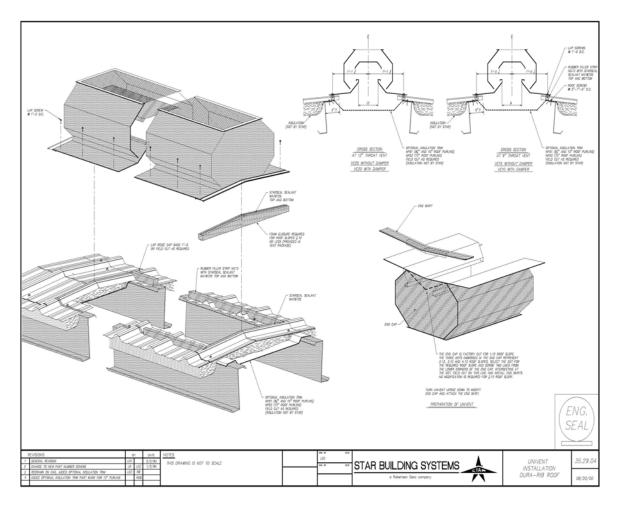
Roadway Steel Structure – Mesa Ridge Vent Design
